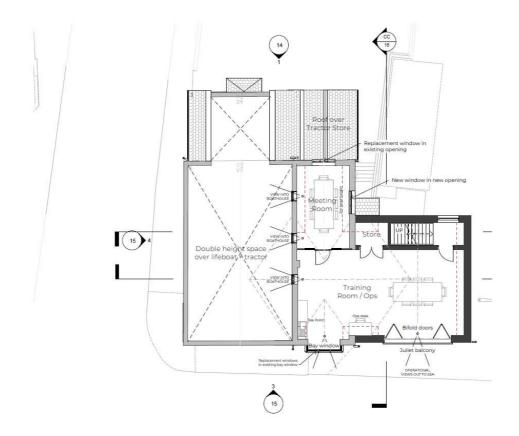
Proposed ground floor plan by Studio Four Architects
